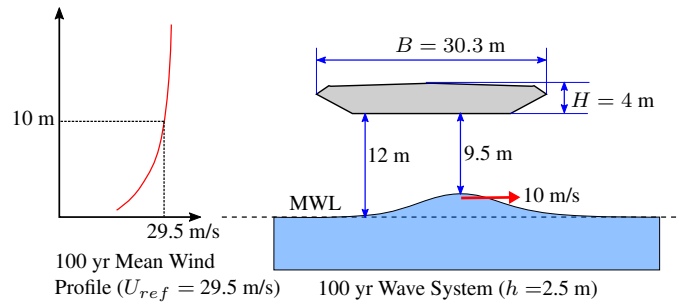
Load case for a low-elevation bridge deck subjected to wind and a bypassing solitary wave.
